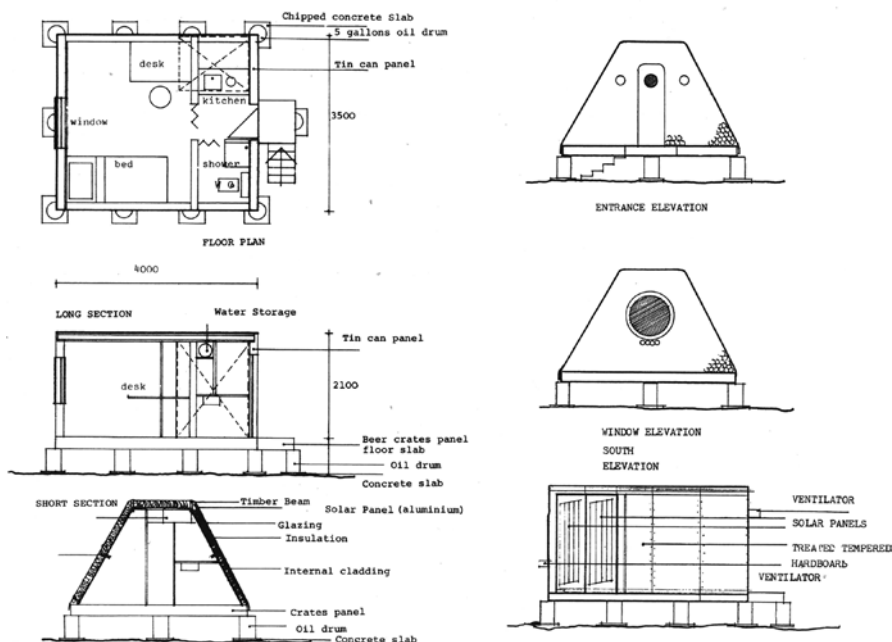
Small house in London, SUG, elevations, plan, section. (Source: Pawley 1975a)
